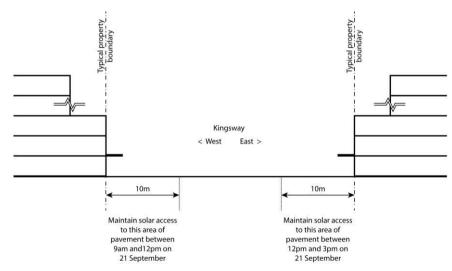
Solar Access: Kingsway between Bogong Avenue and Railway Parade North (note: building shown for indicative purposes solely)
